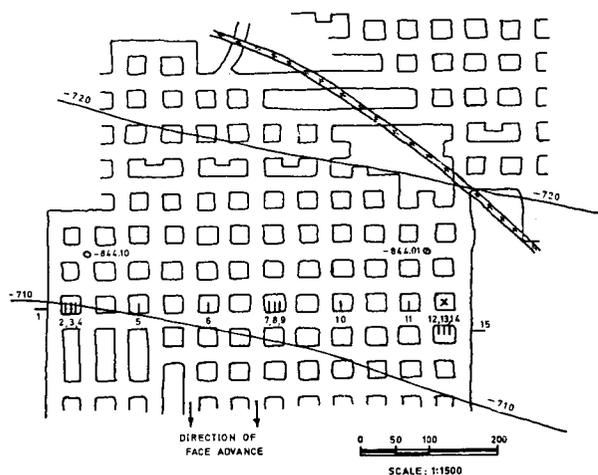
Bethal 23 South Panel, Blinkpan Colliery
